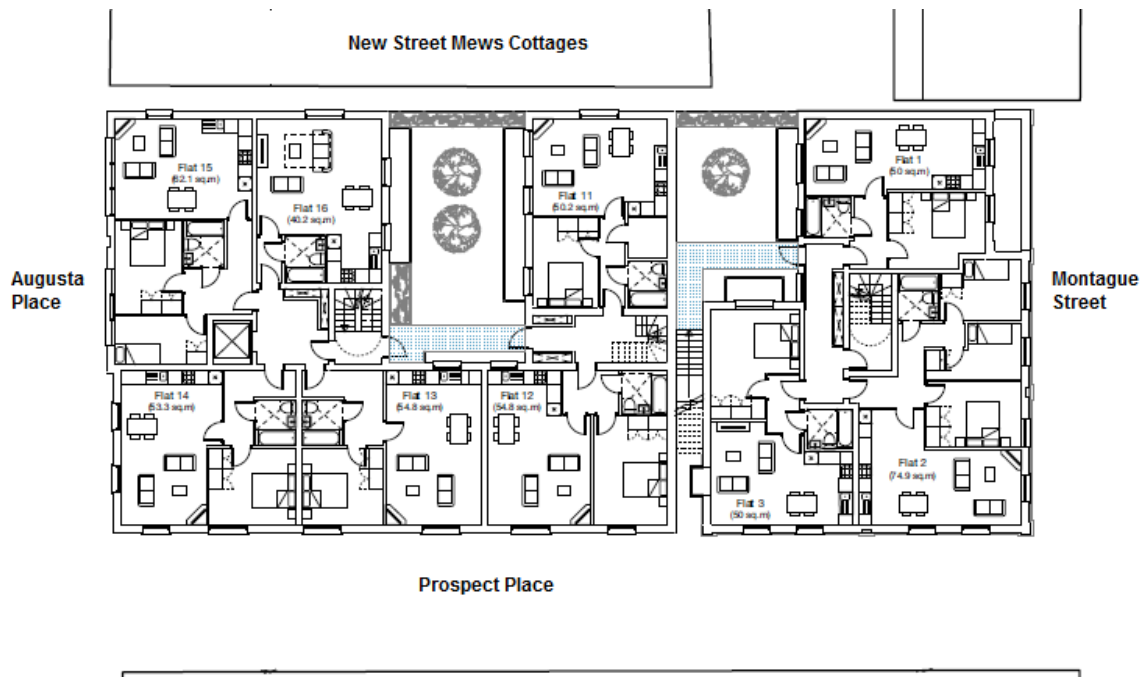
First Floor Layout (terraces shown with planting, central wing in between)
